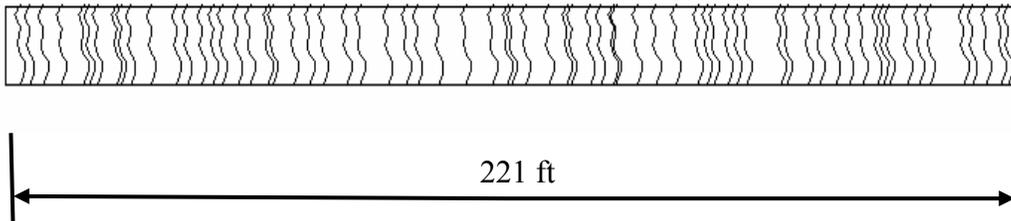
Layout of Cracks along Section 4—SF1-40
